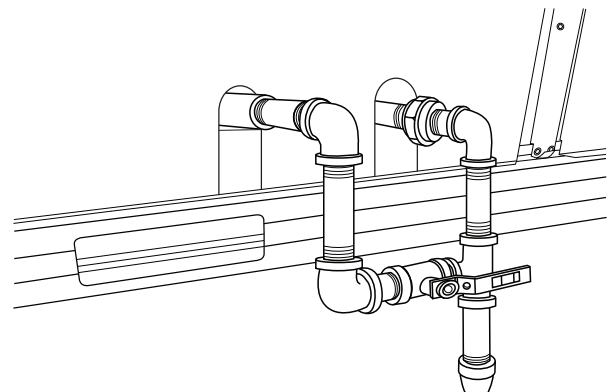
Gas Piping, Typical Thru-Base Connections
